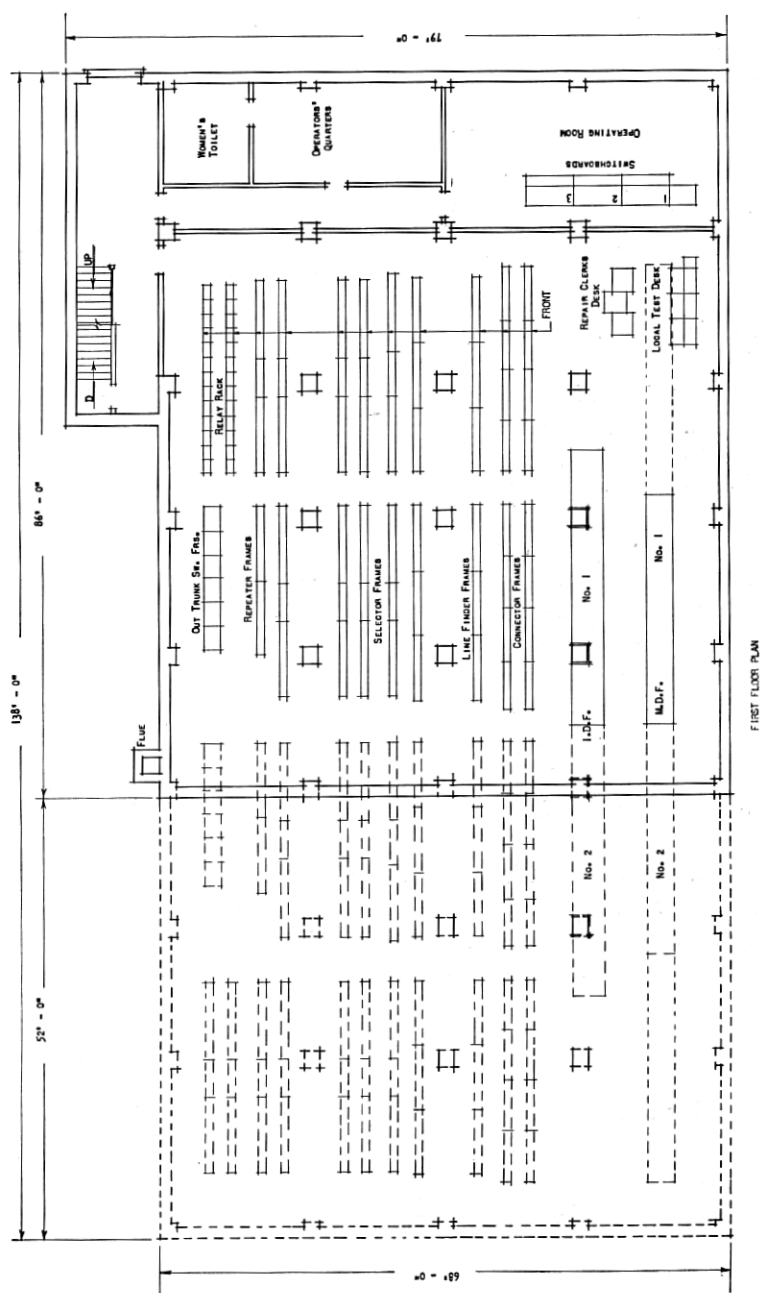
Standard floor plan for step-by-step dial office designed for best arrangement including flexibility for future growth.
